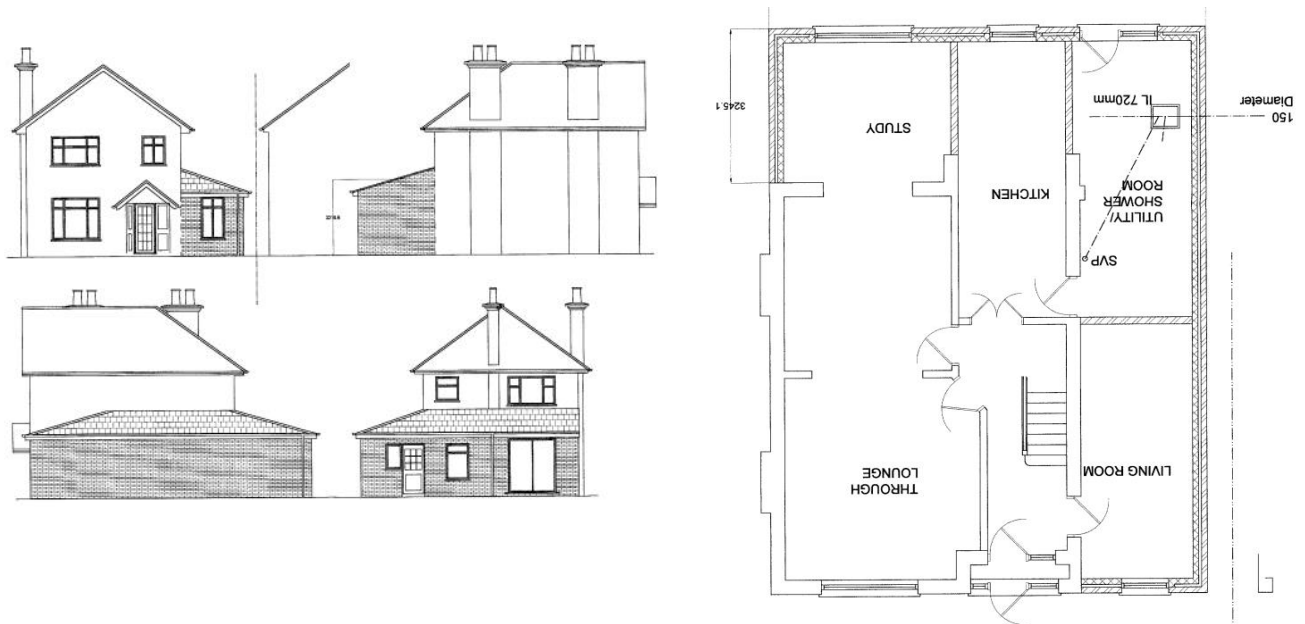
Ground Floor Plan (Source: Hillingdon Planning Search)
